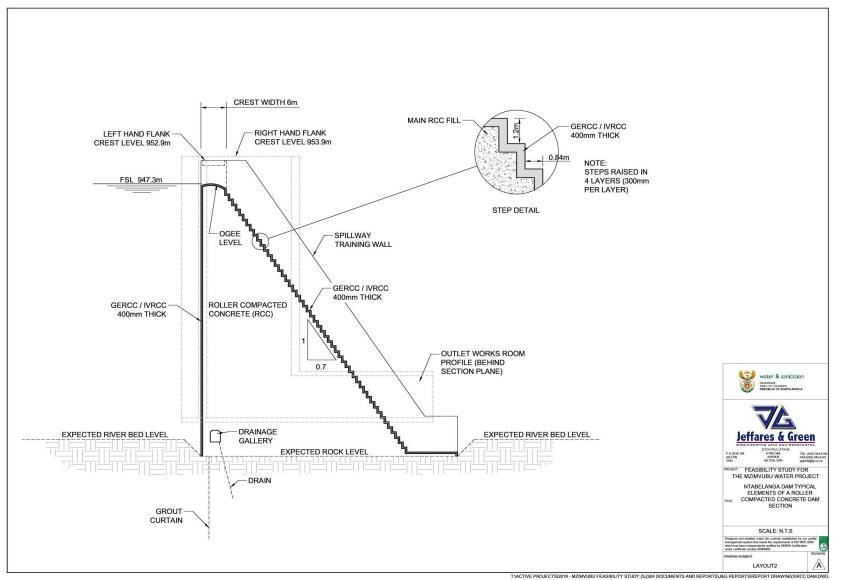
RCC Dam Wall and Spillway Typical Cross Section
